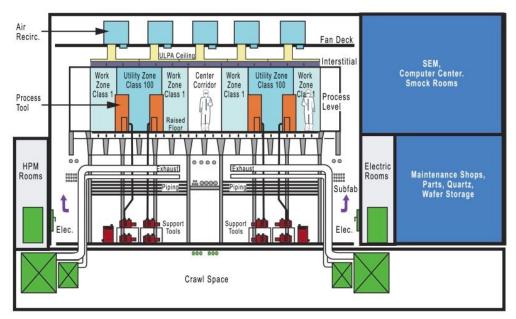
Cross-section view of a wafer fab (drawing courtesy MKS Instruments).
